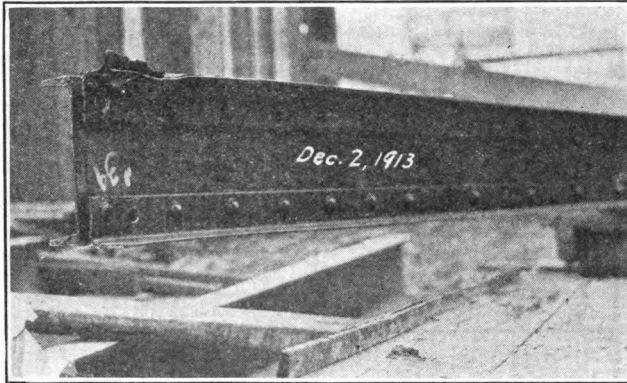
SPECIMEN OF DEFECTIVE RE-ROLLED STEEL.
